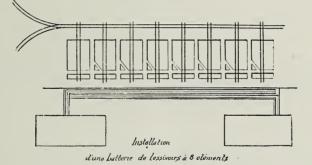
General plan, showing arrangement of lixiviation tanks, channels, reservoirs, and tramways.
